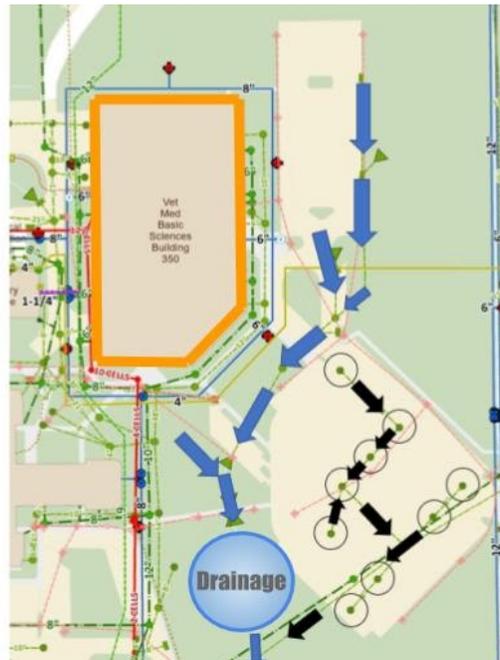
Stormwater routing near entrance to College of Vet Med
